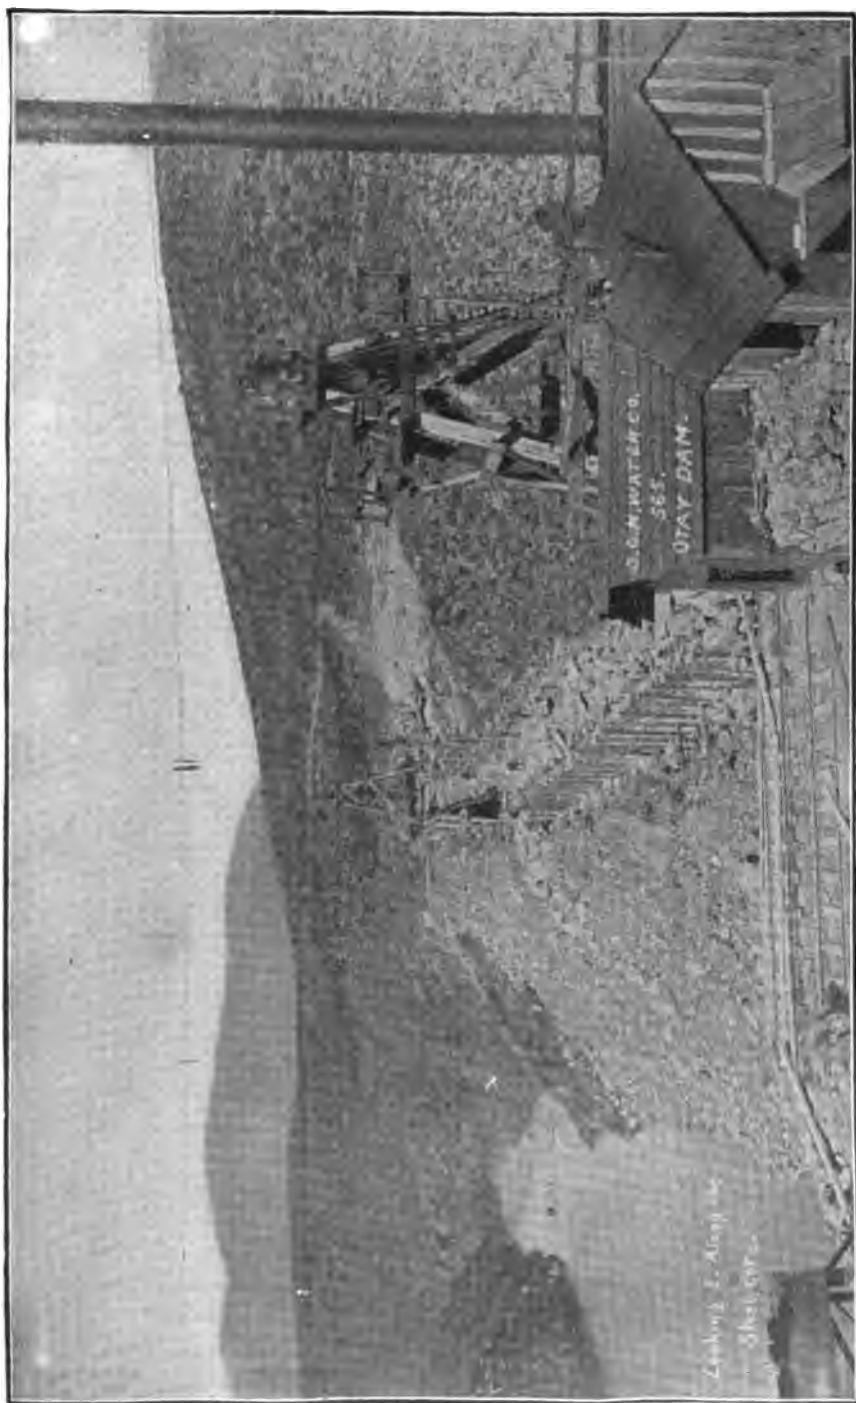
OTAY (CAL.) ROCK FILL DAM—STEEL CORE.
